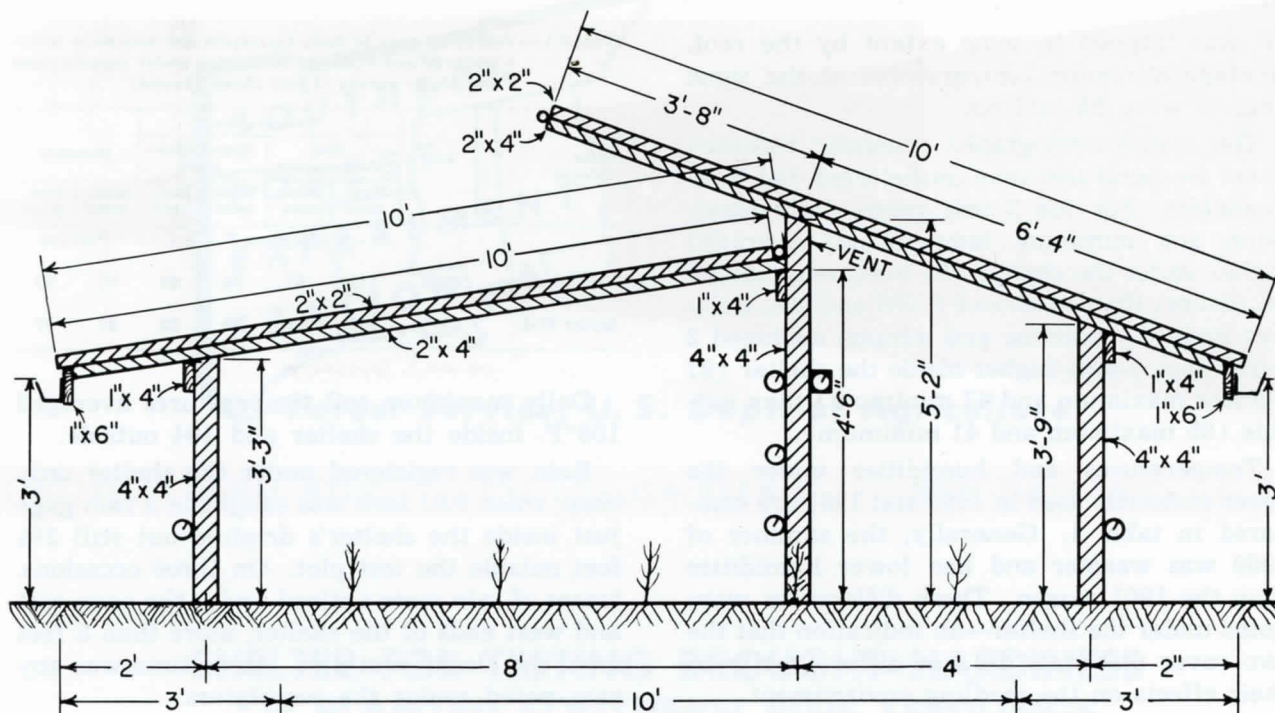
Cross-sectional dimensions of the shelter's frame.
